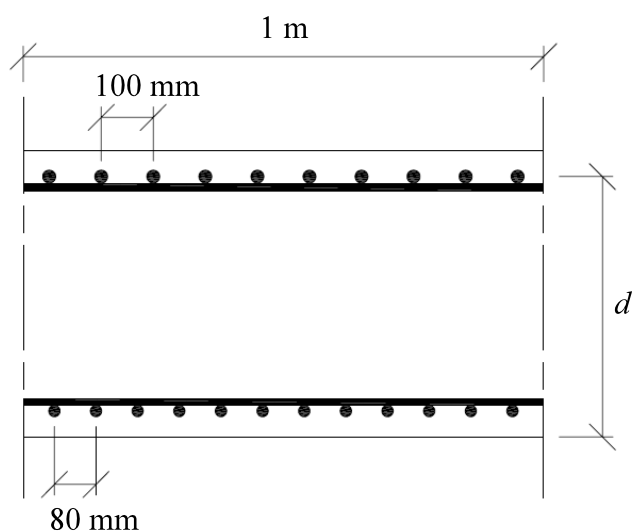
Existing reinforcement arrangement in the most heavily reinforced section in the actual region.
